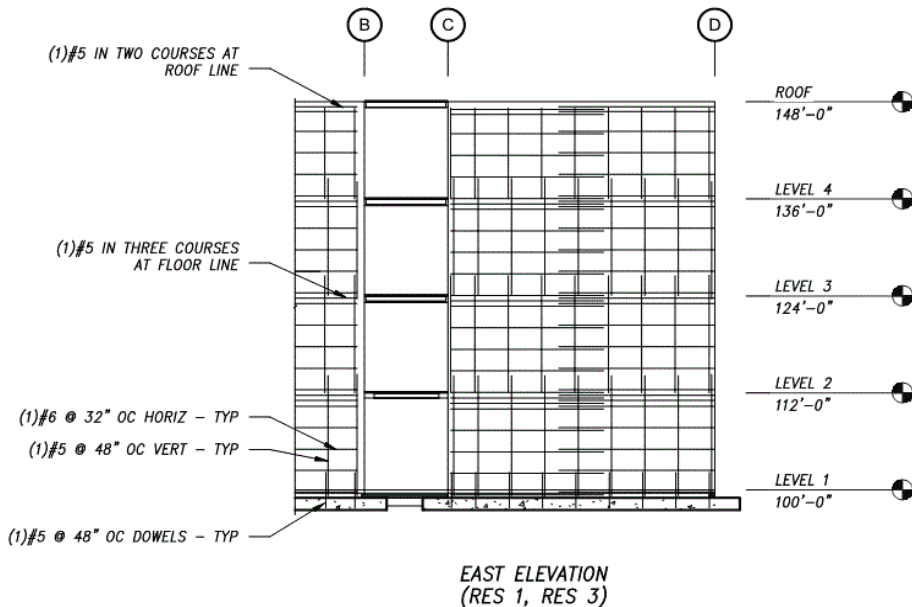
Four-story residential building East elevation: RES1, RES3.
